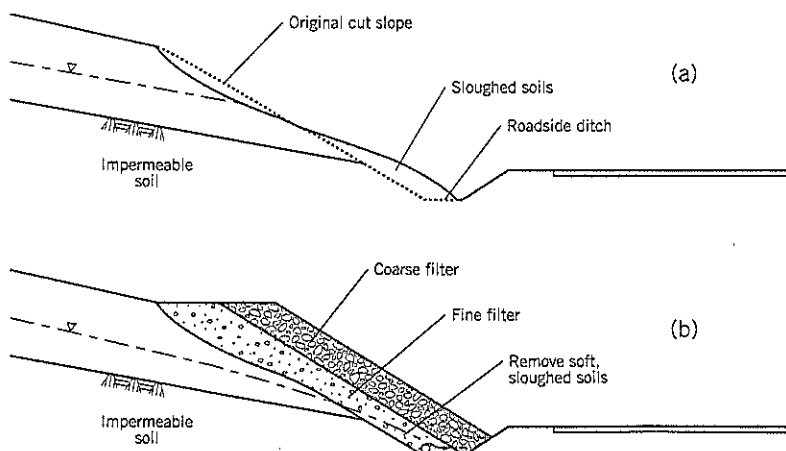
Drainage blanket remediation: (a) failed slope (b) filter layers placed on the outside of the slope
